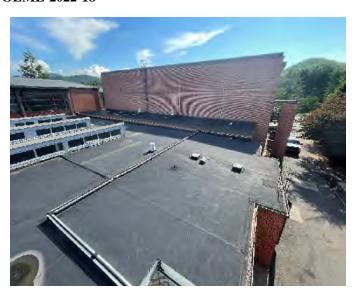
Roof Overview Displaying Portions of Roofs A2, A3 and E1
